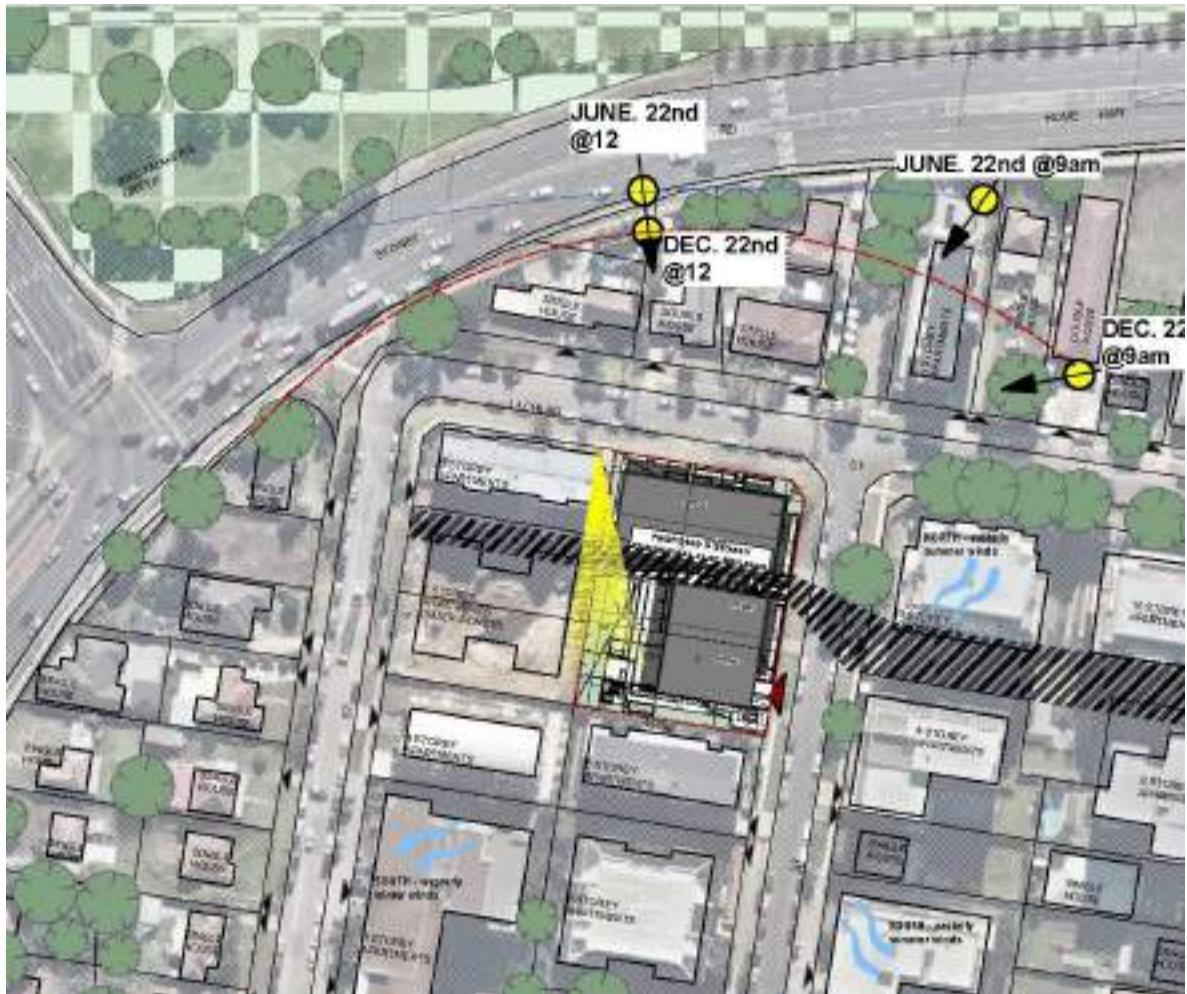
Site analysis extract showing consistency of site coverage, building separation, height and setback with adjoining development.
